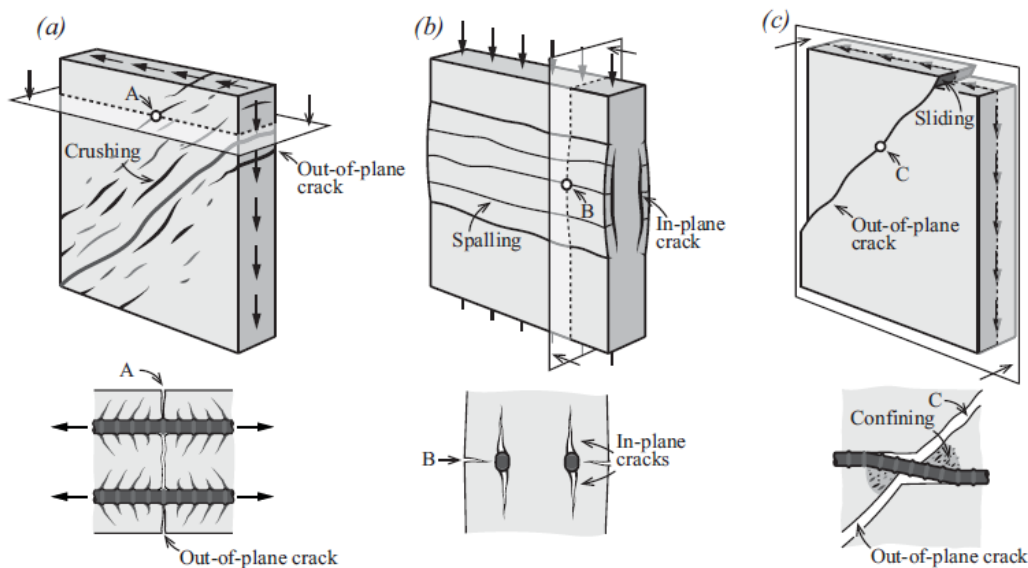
Failure mechanism of reinforced concrete panels: (a) concrete crushing; (b) concrete cover spalling; (c) concrete sliding. Niketić (2017) [19]
